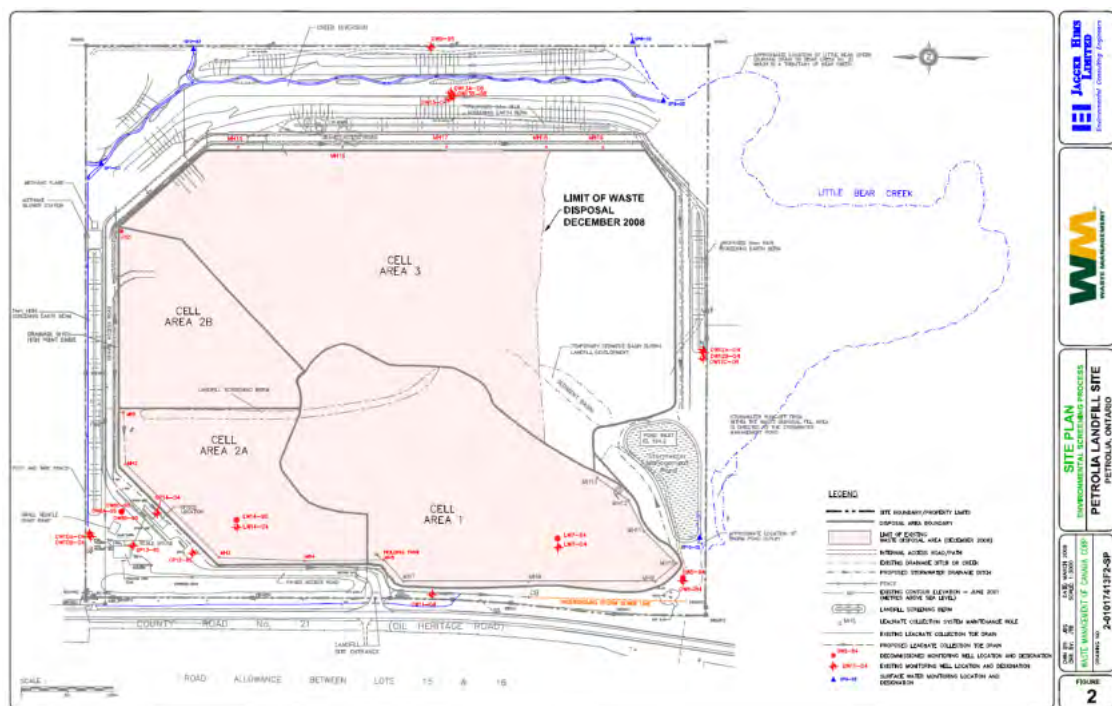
Petrolia Landfill Site Layout (Jagger Hims Ltd. 2009)
